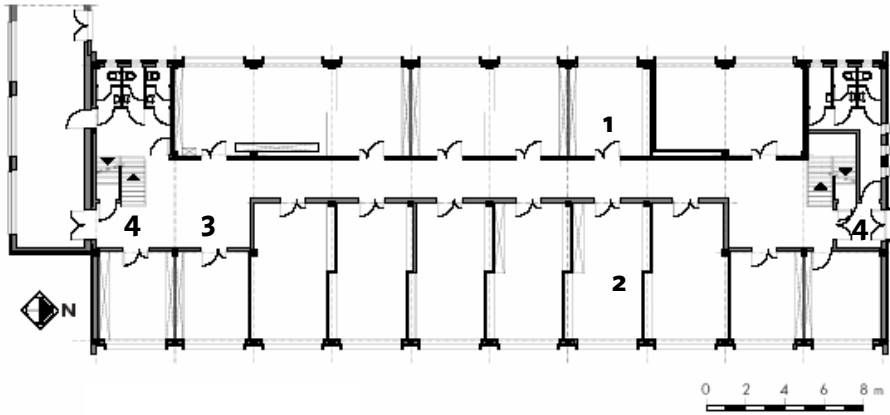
Plan of the ground floor of the PROBE building with offices on the west (n°1) and the east (n°2) side, central corridor (n°3) and stairwells (n°4) on each side
